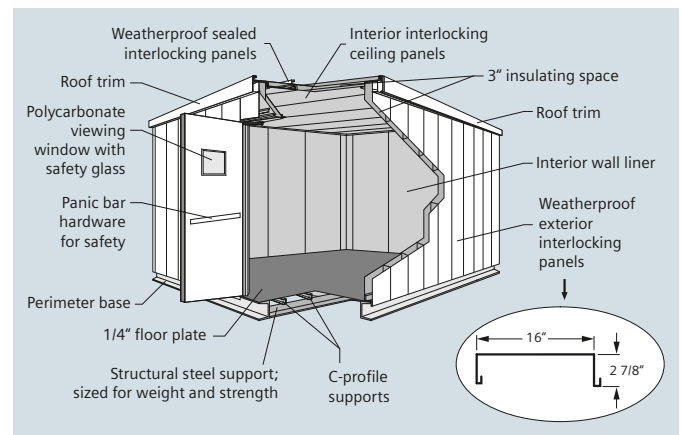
The most widely used design of SIEHOUSE consists in self-framing, interlocking wall and roof panels that are installed on a structural steel support
